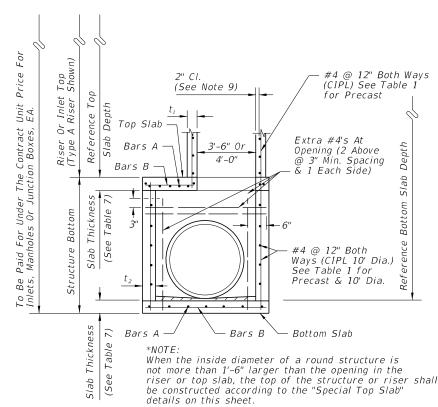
DETAILS FOR SKEWED PIPES IN RECTANGULAR STRUCTURES
